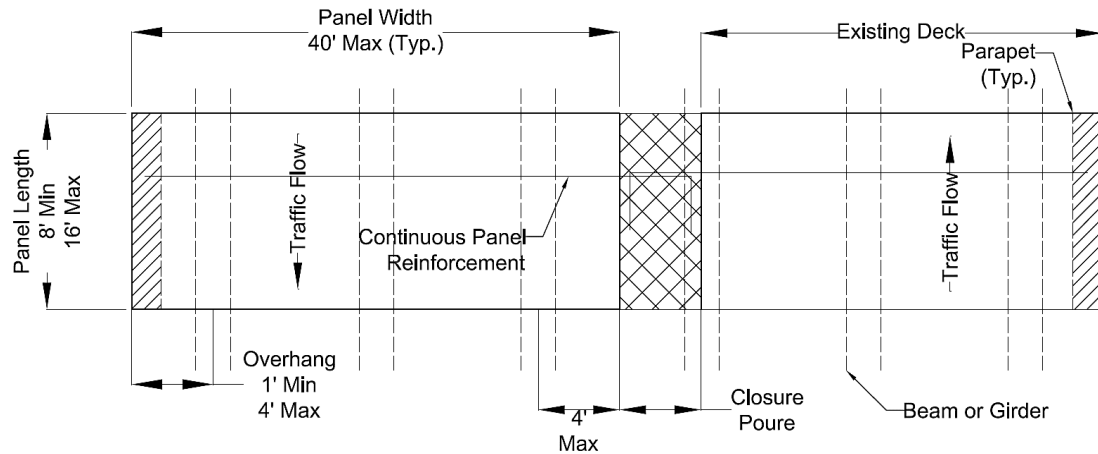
Stage construction configuration for full-depth deck panels (Source: UDOT 2010b)
